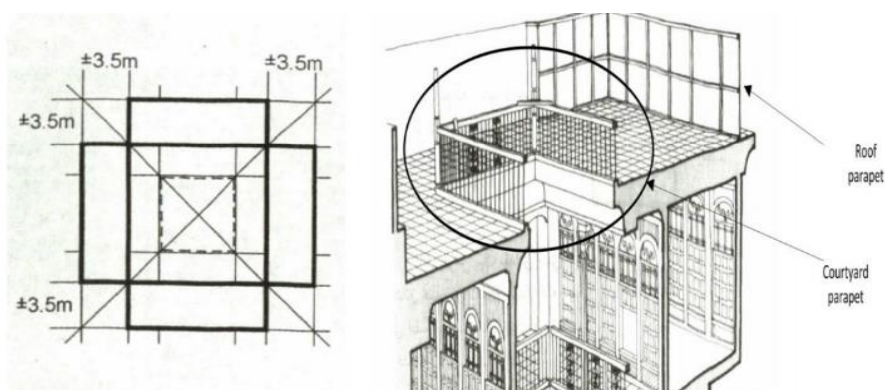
Floor plan and section view of the internal courtyard-shaft, atrium-well of the house.
